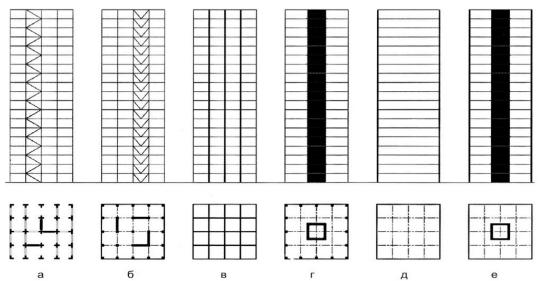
Structural systems of high-rise buildings [1] : a - frame and link; b- frame with rigidity diaphragms; c- frameless with bearing walls; d- stem system; e - box; f- stem boxed
